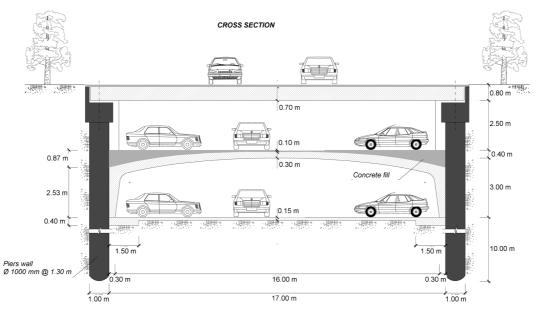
Parking under construction in Granada (Spain), in which the retaining wall is a pier wall, composed of 1-m diameter piers spaced at 1.5 m on center
